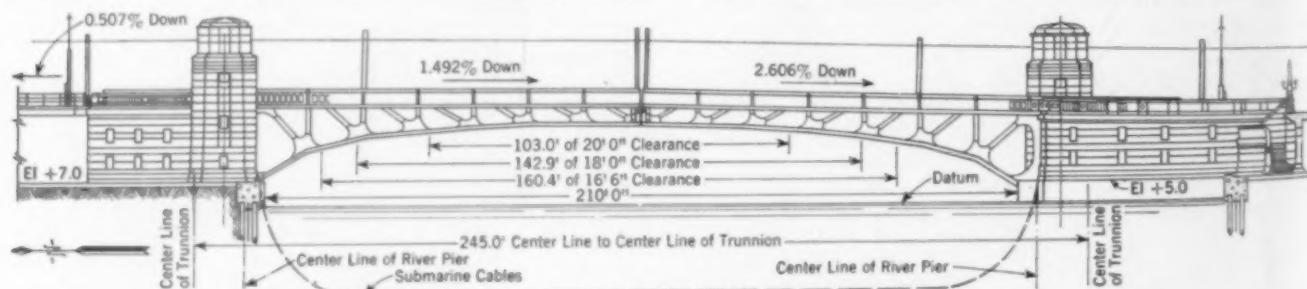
ELEVATION OF THE NORTH STATE STREET BRIDGE
